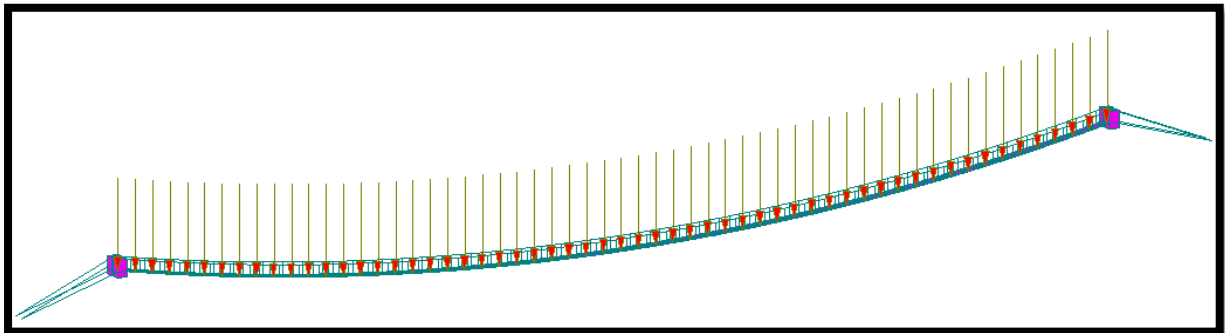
Typical pedestrian cable suspended bridge for Jogging pedestrian.
